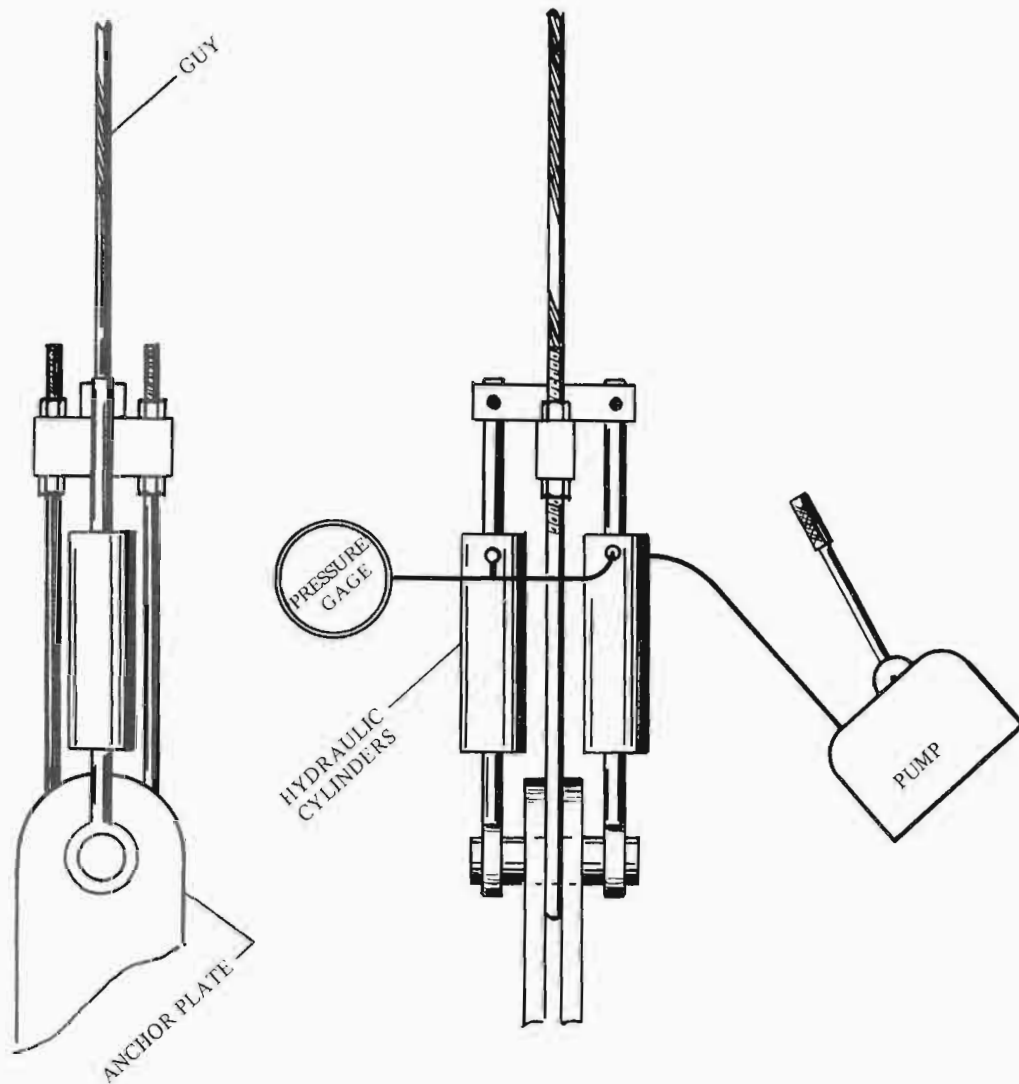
Hydraulic-cylinder method for measuring guy tensions.
